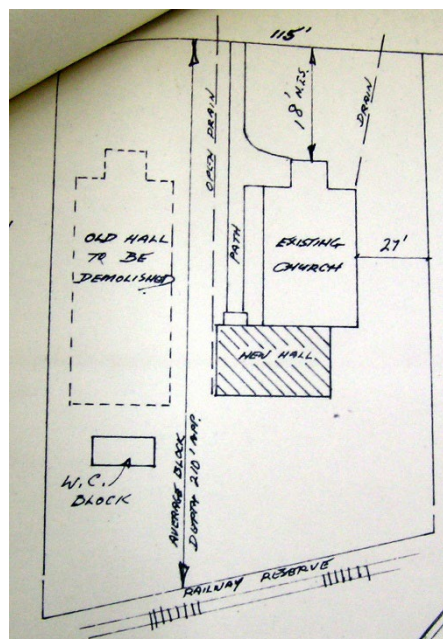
M.F. Murray, Site Plan of the Wallace Methodist Church showing 'old hall' (former Millbrook Methodist Church) proposed for demolition (right) and the rear addition to the Church building (former Bolwarrah Methodist Church), 1965.
